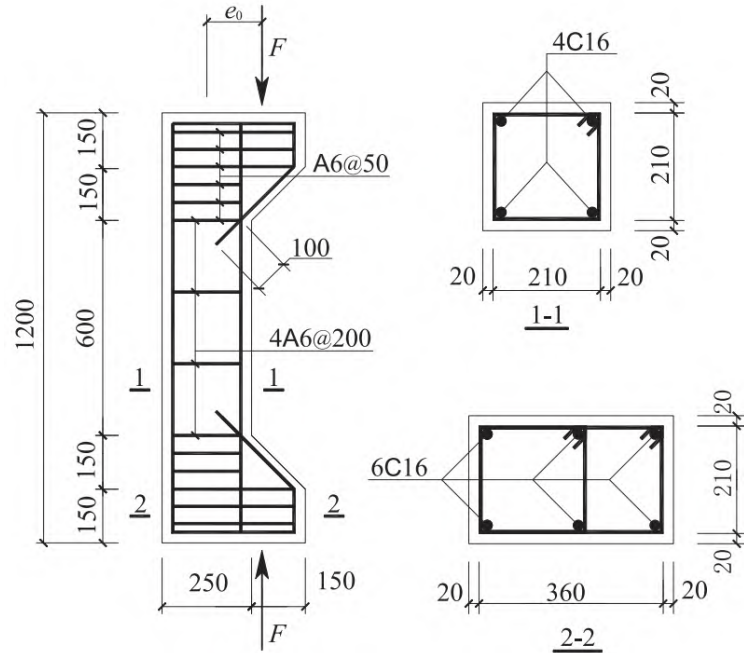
Cross-section and reinforcement details of specimens Li et al. (2021)
